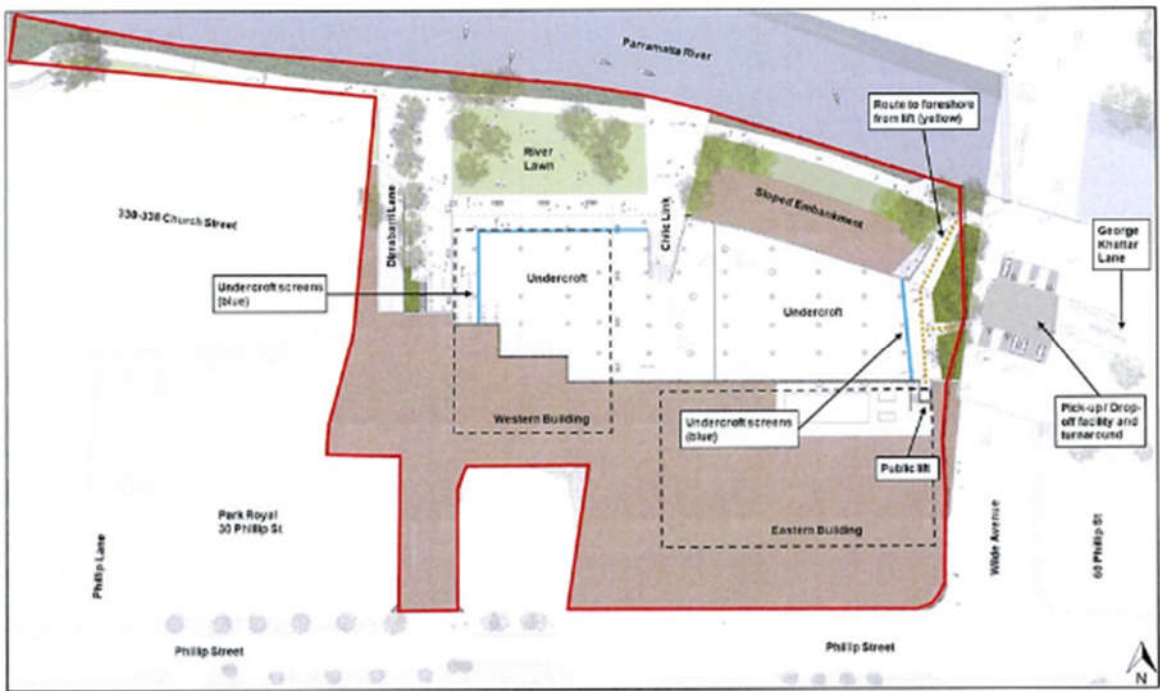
Proposed lower ground floor and undercroft layout and key features (Source: Project RtS as modified by Powerhouse Parramatta (SSD 10416) Assessment Report, Department, 2021)
